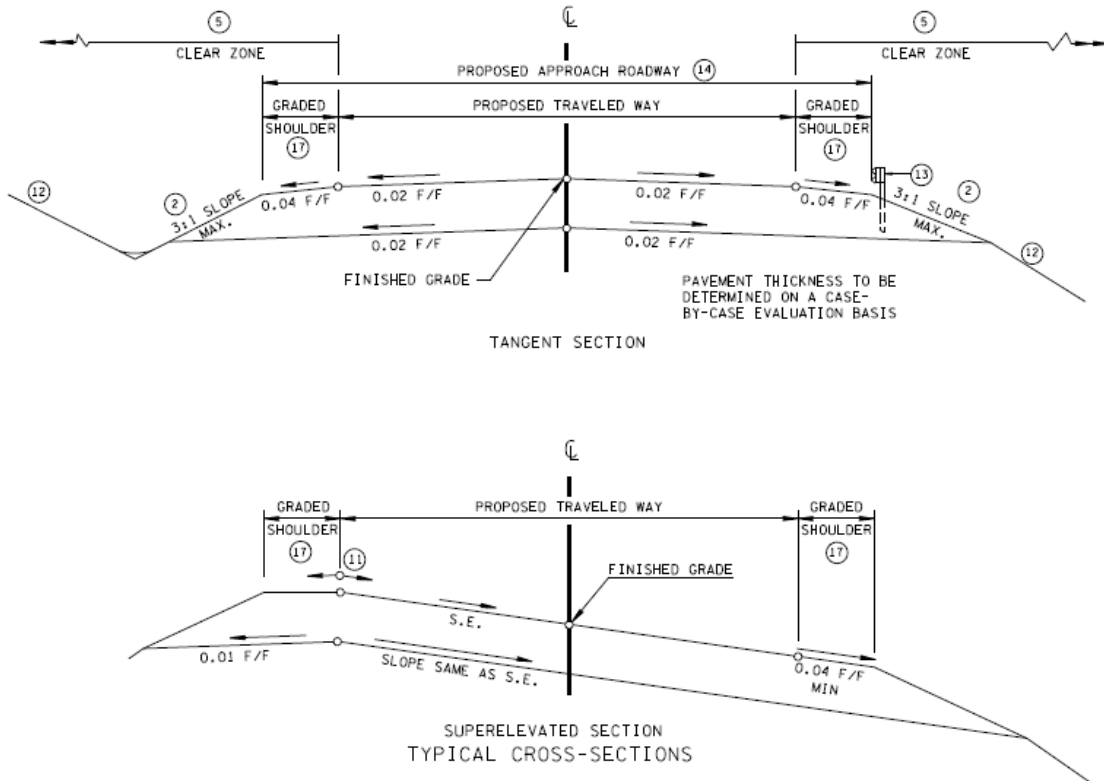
TDOT Typical Sections (20' Proposed Traveled Way and 5' Shoulders)
